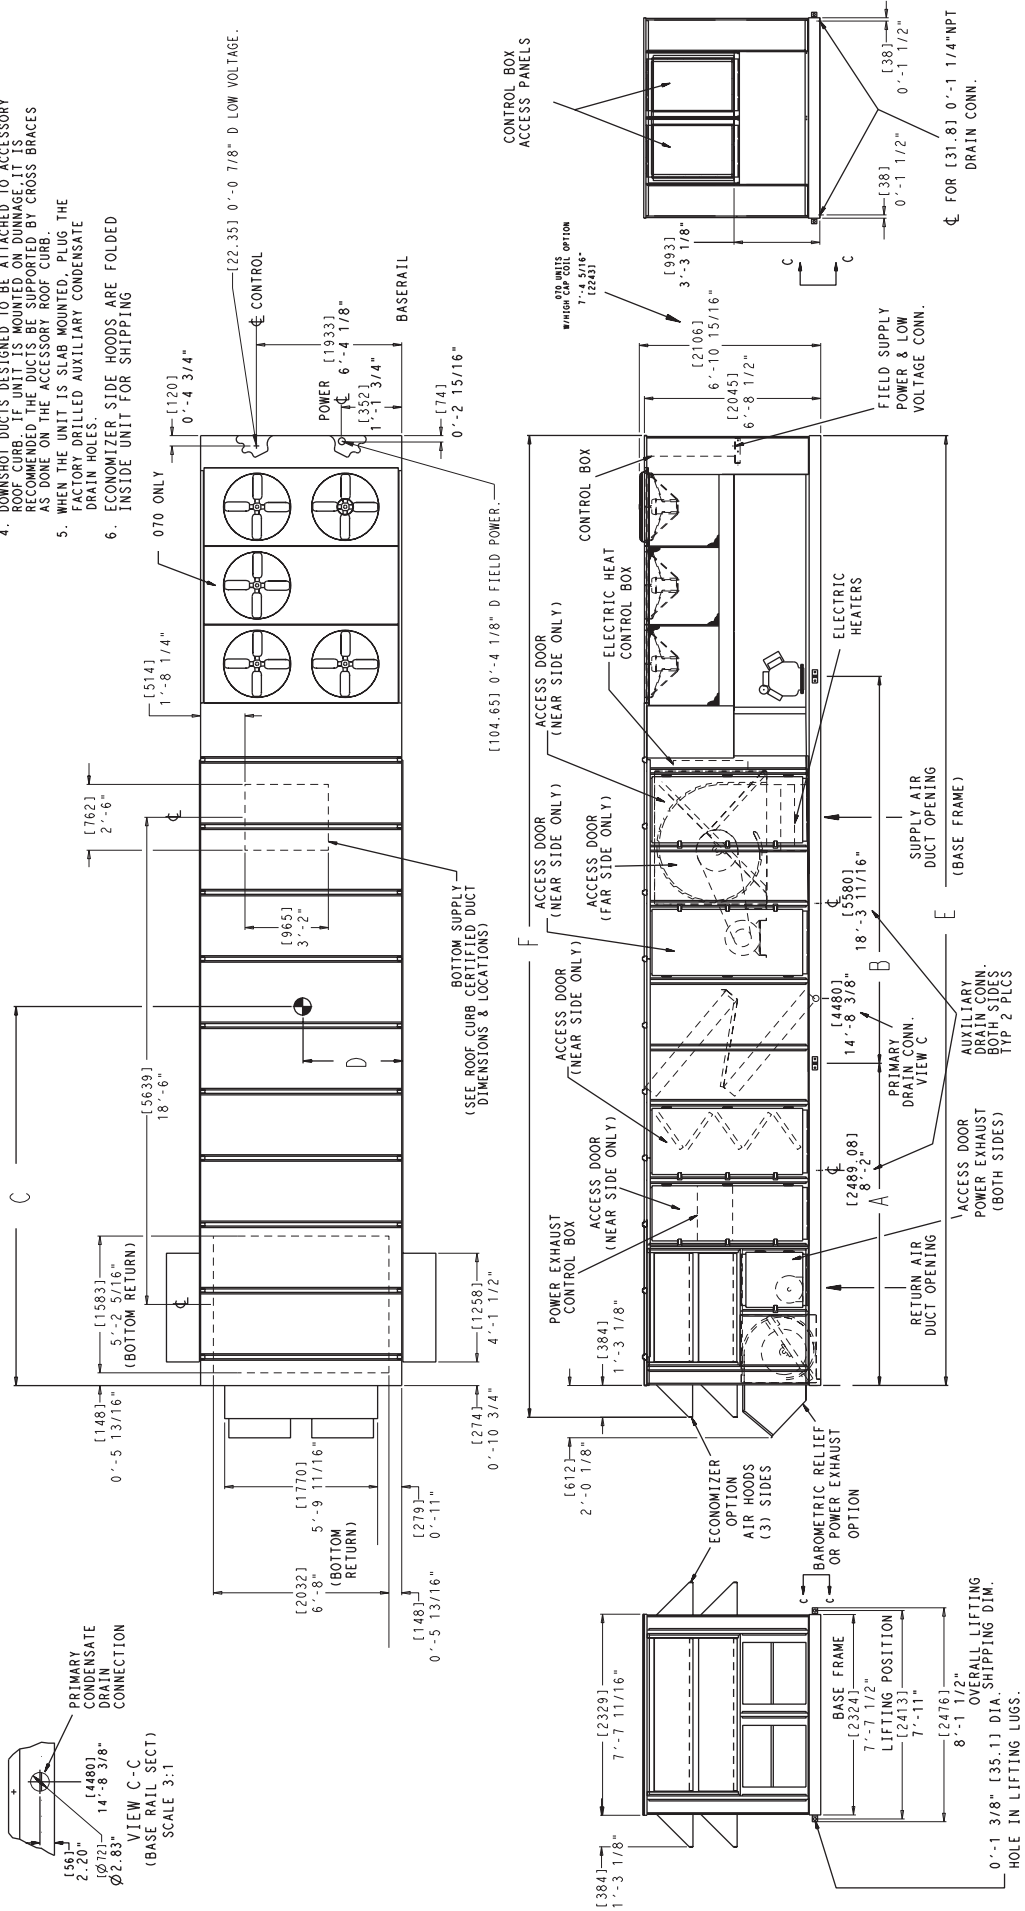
Base Unit Dimensional Drawing — 50ZG,ZN055-070 (Standard Chassis)
